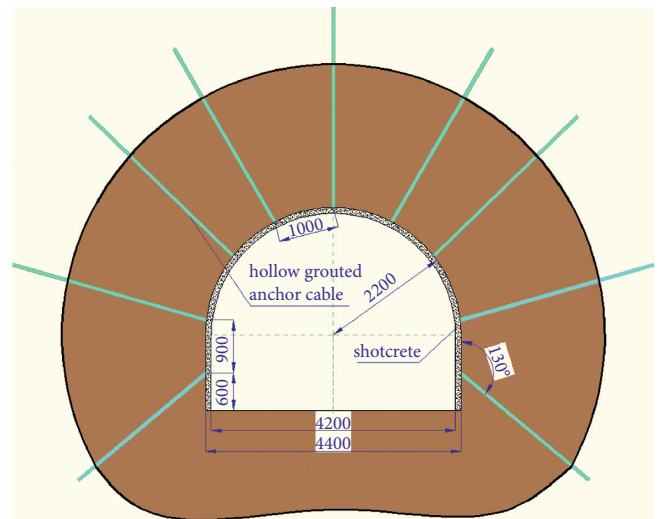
“Hollow grouting anchor cable + spray” support.
